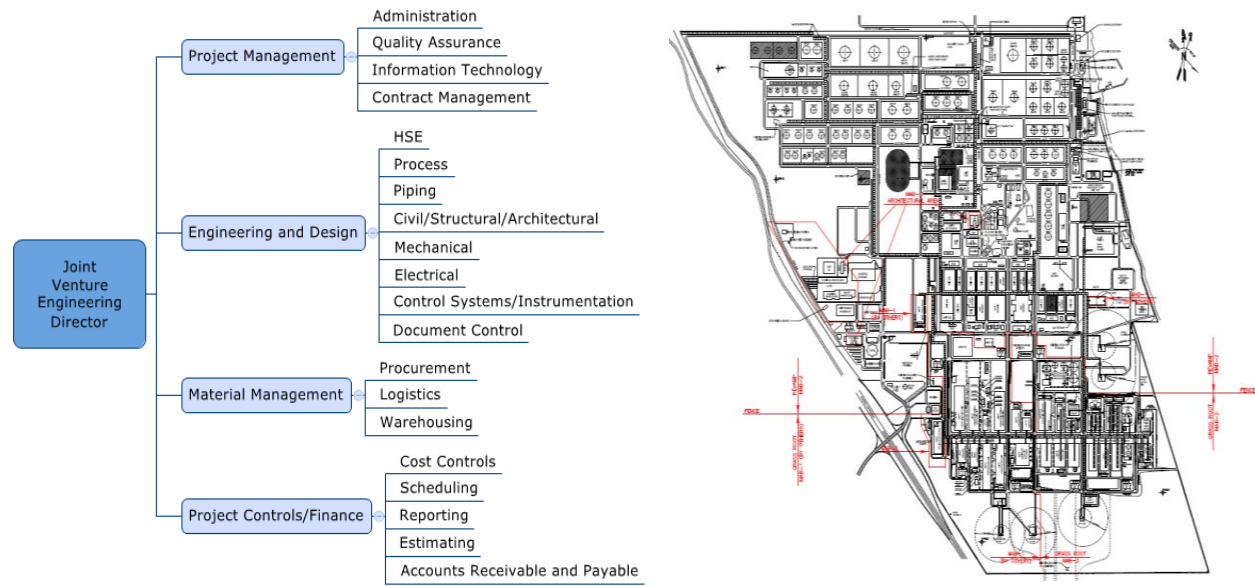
Organization Structure (left) and Overall Plan of Case 1 (right)
